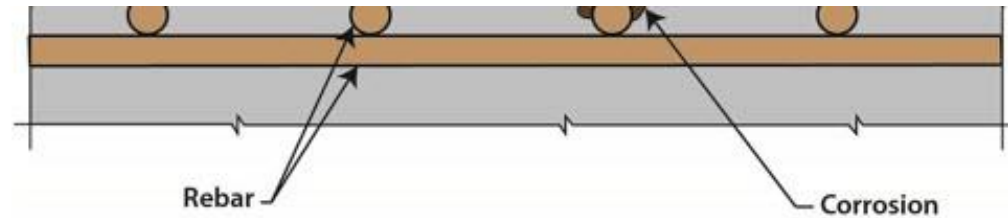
Typical Reinforced Concrete Deck and Slab Deterioration
